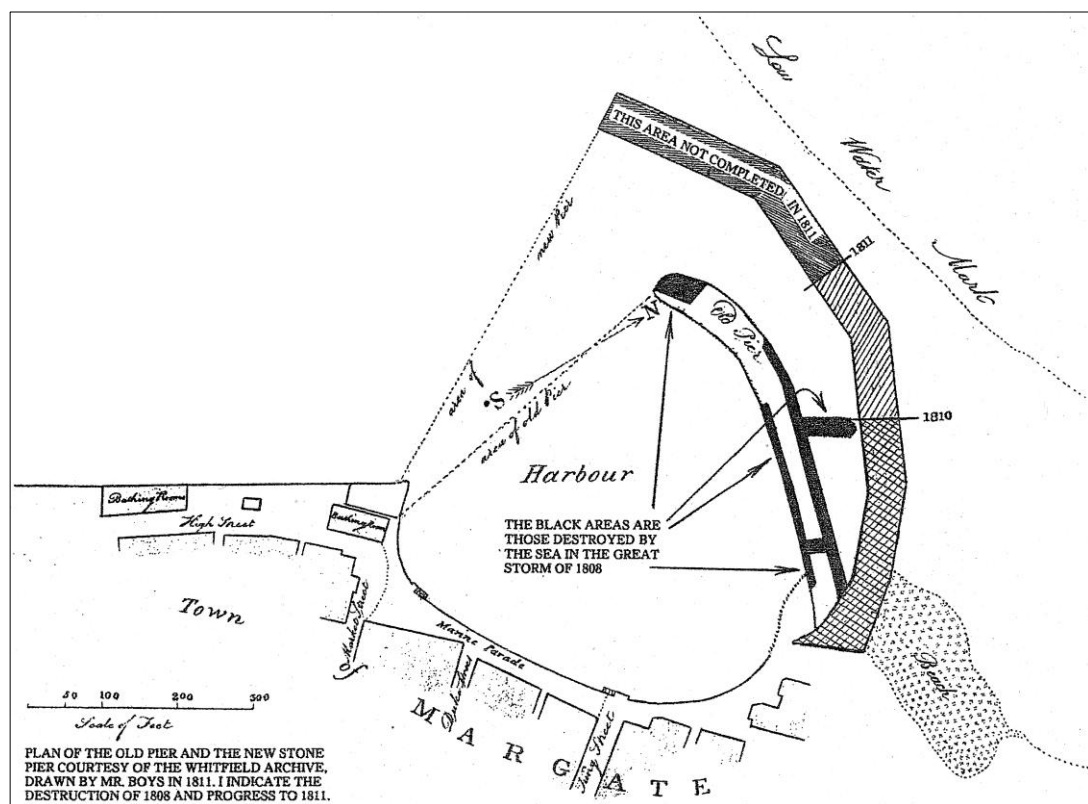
, Margate. Boy's map of 1811 showing outline of smaller stone-clad timber pier and new larger stone pier beyond (reproduced from Twyman 2006)
